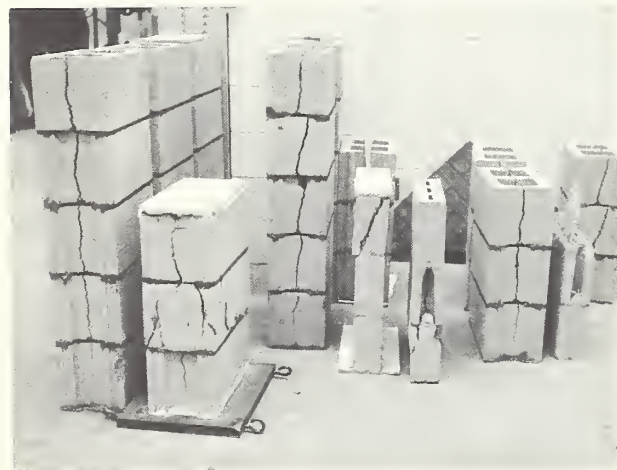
Failure cracking in 3- and 5-block high prisms constructed with hollow block.
